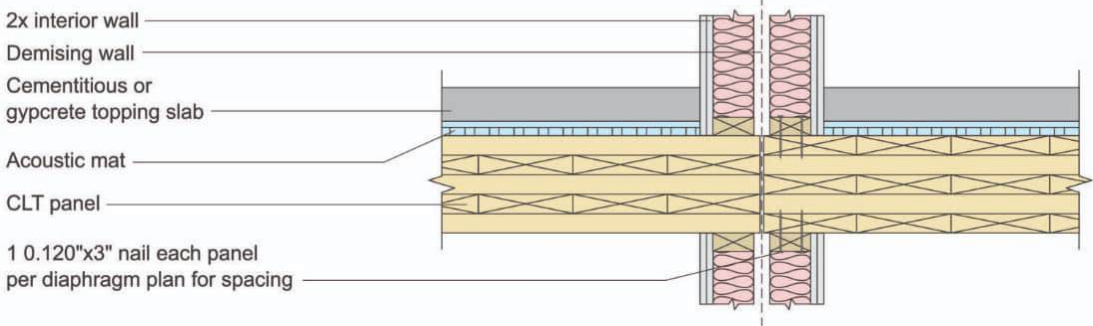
Isolated mass timber floor panels at intersection of floor and wall assemblies
